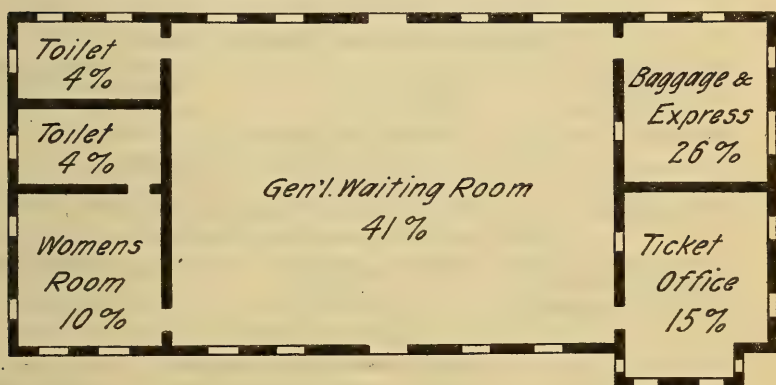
DIVISION OF FLOOR AREA RECOMMENDED FOR PASSENGER STATIONS WITH ONE GENERAL WAITING ROOM.
